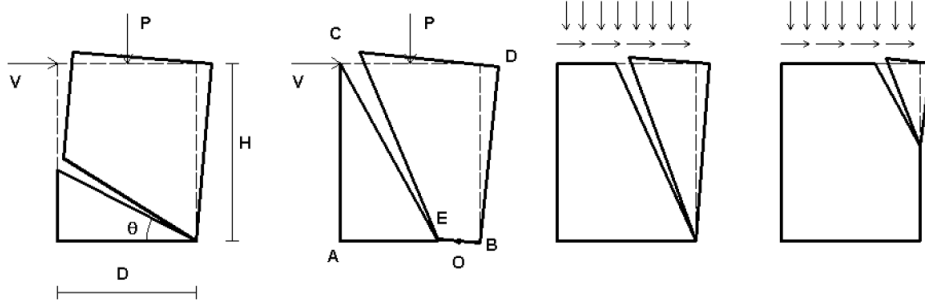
Possible failure mechanism in masonry panels (adapted from [11])
